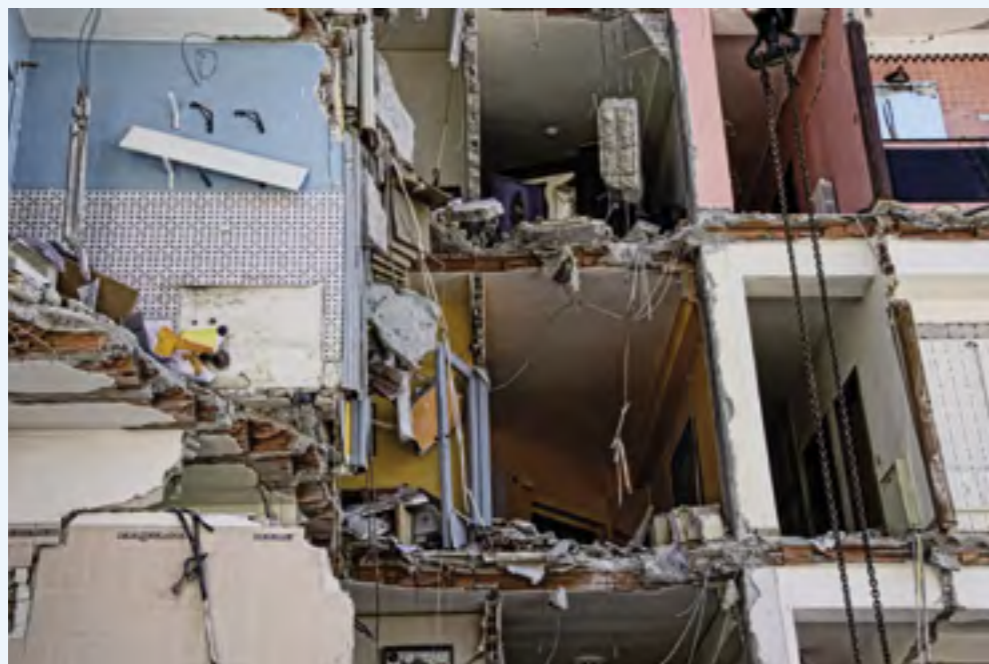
L'Aquila, 2009. Facade of a building destroyed by the 6 April earthquake.
